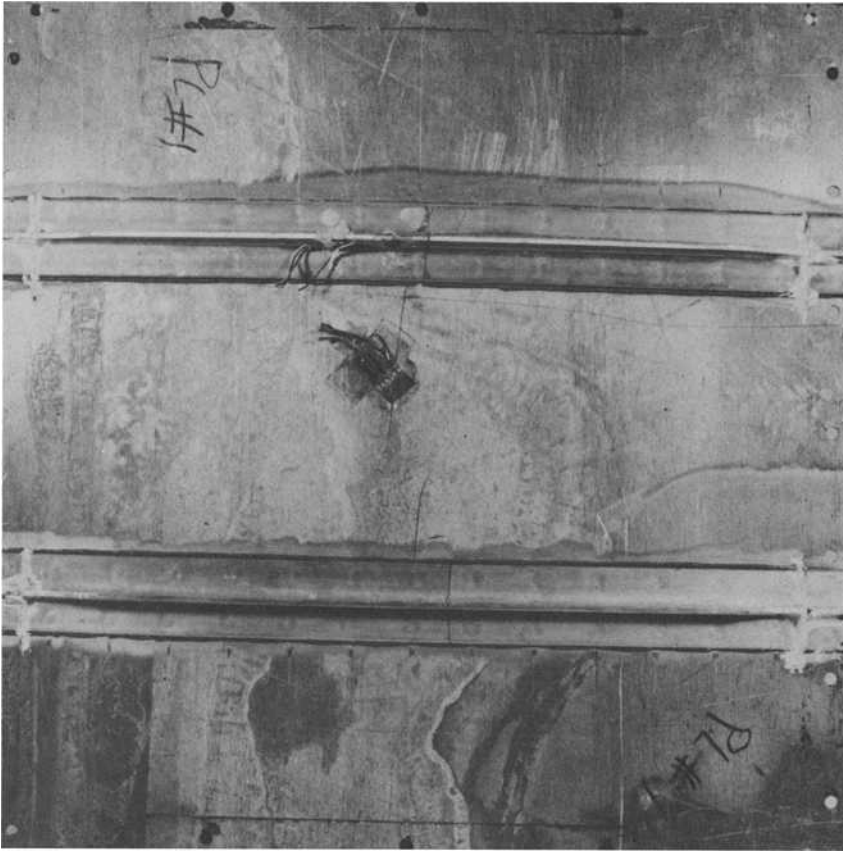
Panel I after fatigue testing: top (tension) side.
